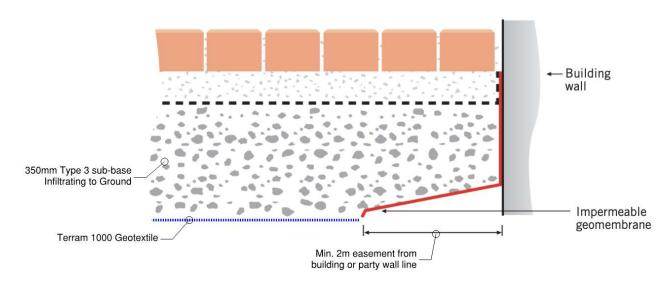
PERMEABLE PAVEMENT USED FOR THE HARDSTANDING AREAS
